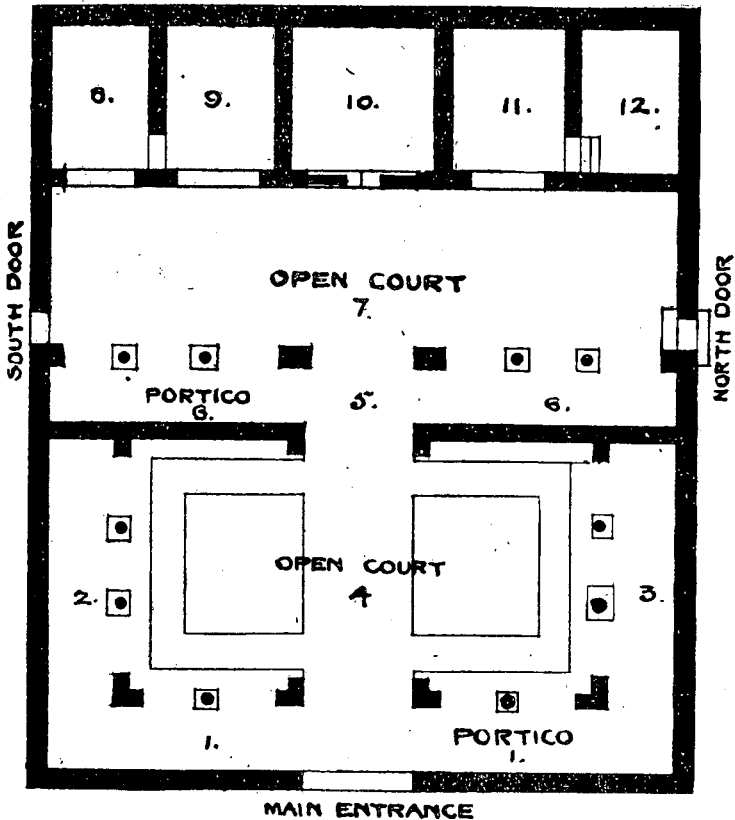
ORIGINAL PLAN OF THE PRAETORIUM AT HOUSESTEADS, RECONSTRUCTED.
